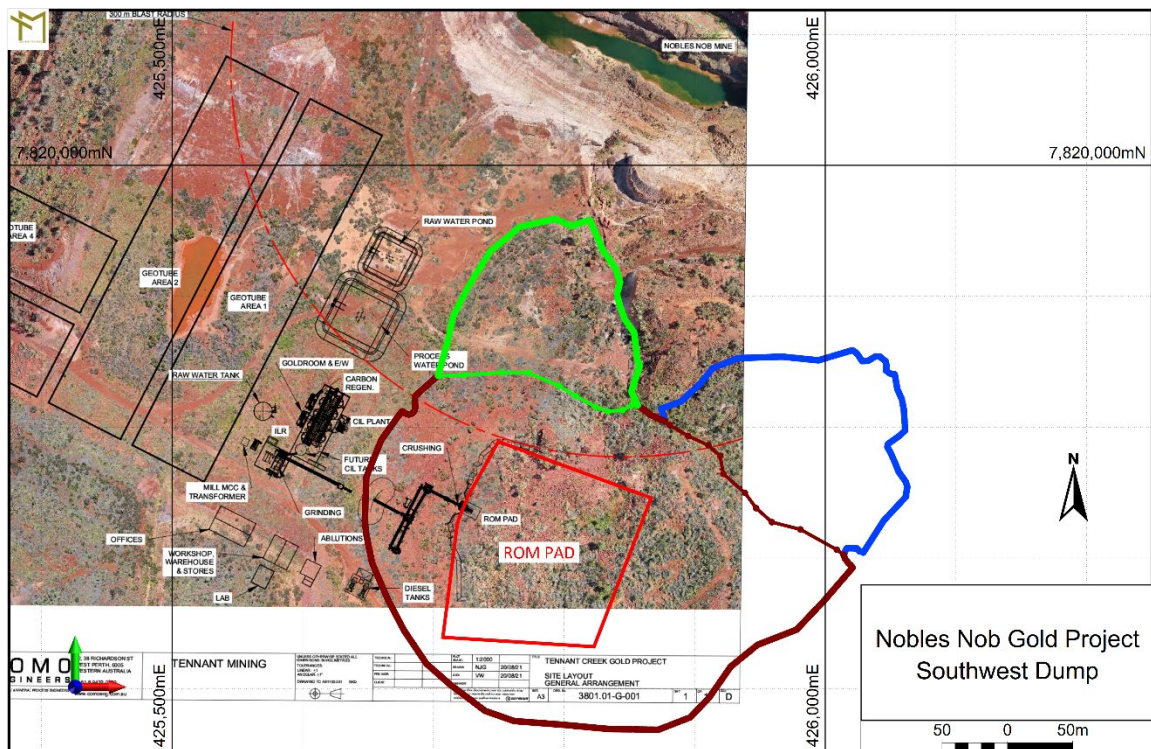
Plan view showing planned plant layout with ROM pad that will be established in the footprint of the reclaimed SWD
